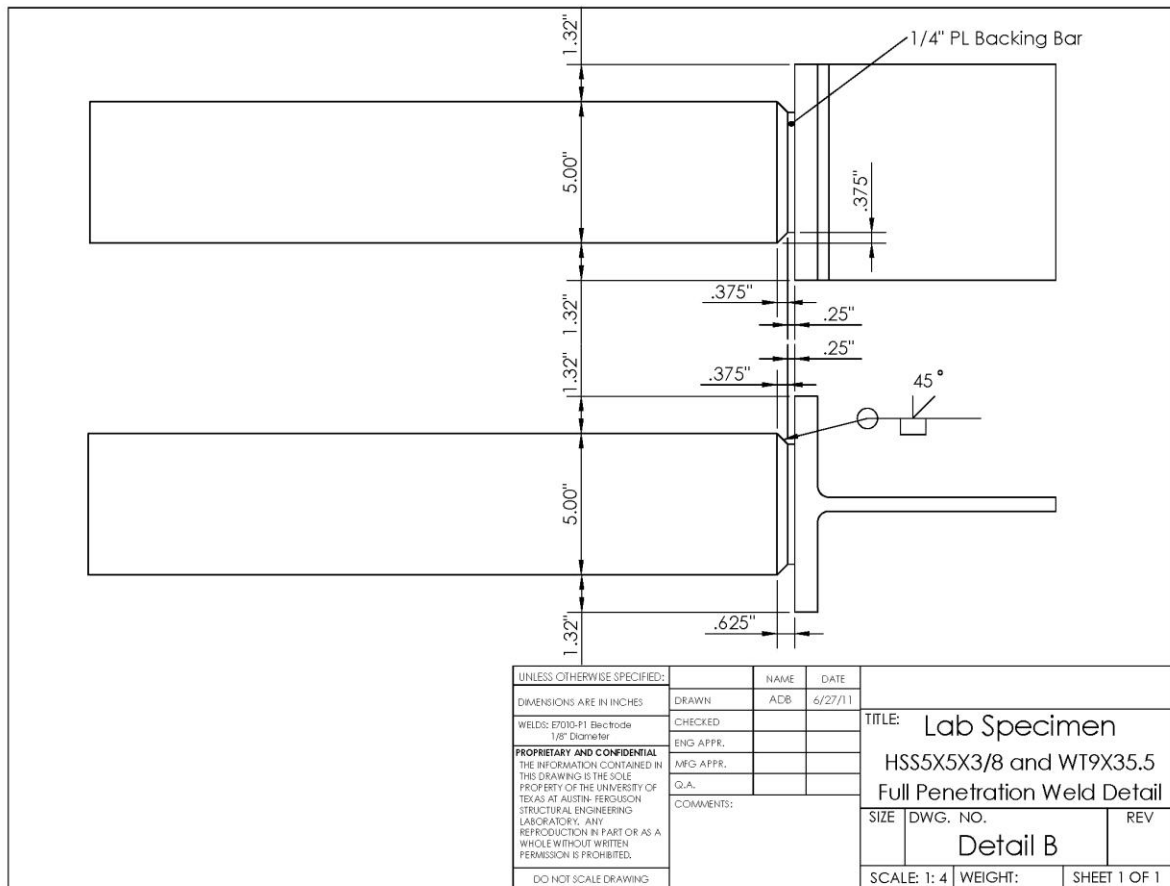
Complete Joint Penetration Groove Weld Detail
